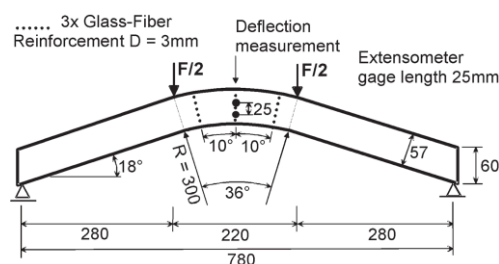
Schematic of the laminated arch model testing setup used by (Kasal and Heiduschke 2004).
